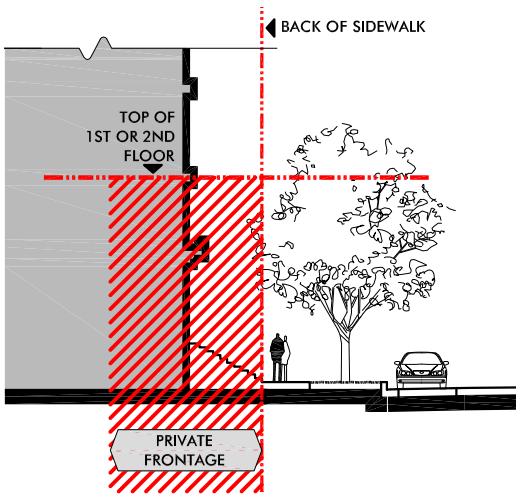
PRIVATE FRONTAGE TYPES - A. DEFINITION
